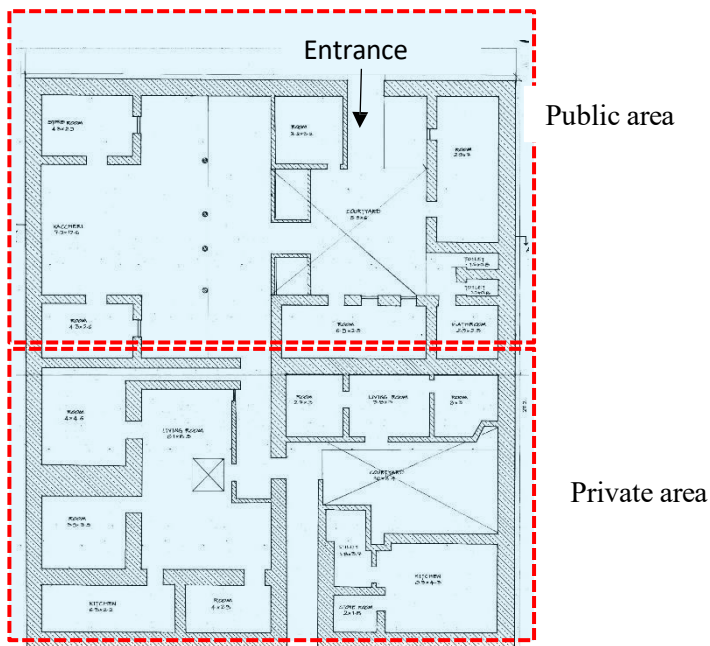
case 3 – Mansabdar house ground floor plan (Source: Author)
